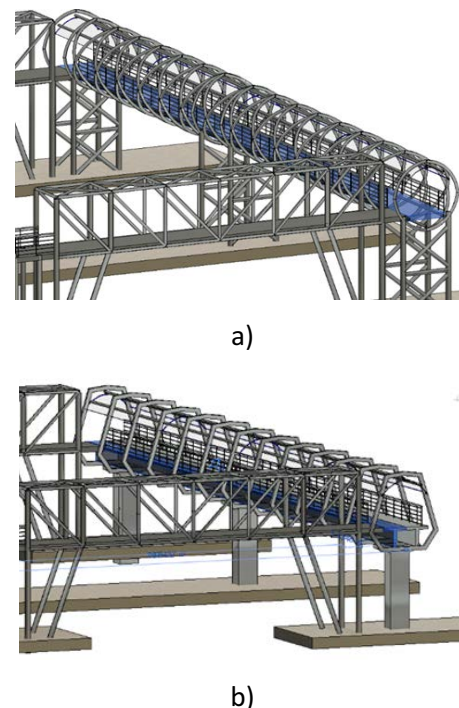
Structures modelled in Revit a) Steel Pedestrian bridge b) OPC and GPC pedestrian bridge
